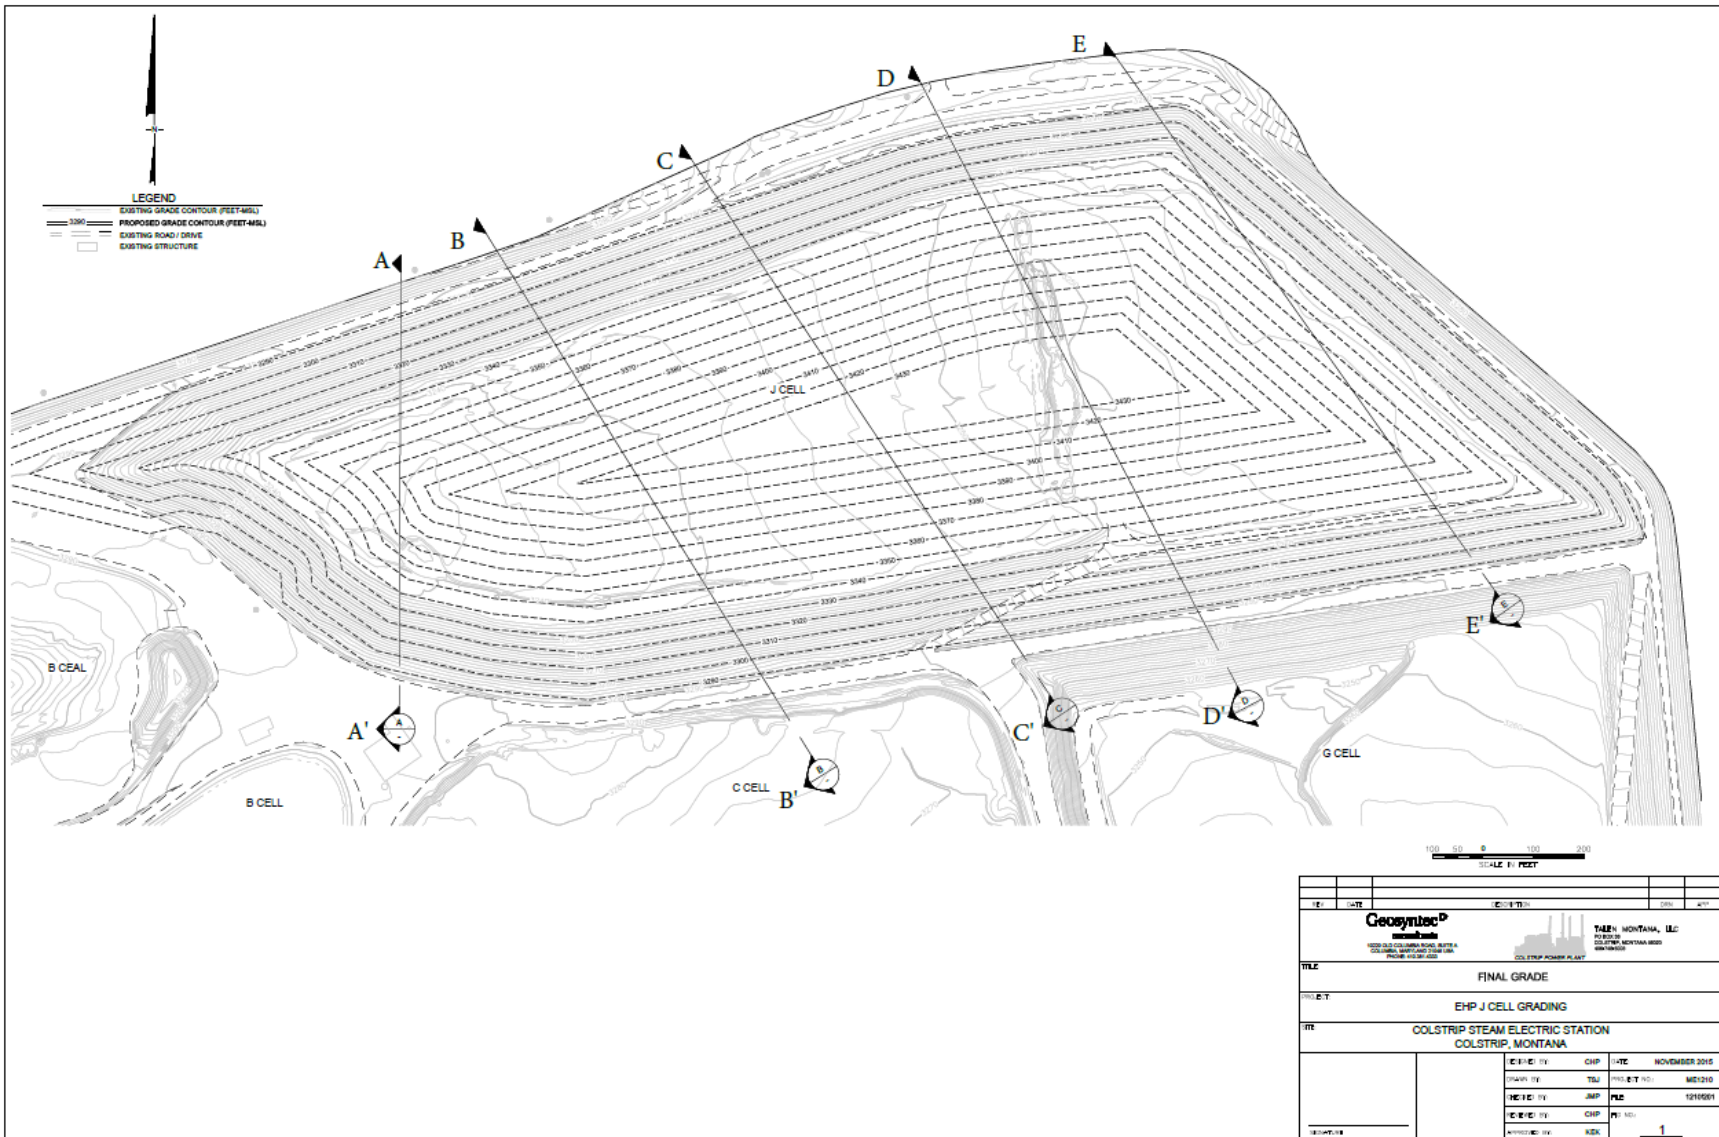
Location of Critical Cross Sections shown on Top of Final Cover Grading Plan
